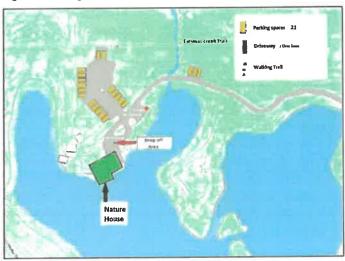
High-Level Concept of On-Site Parking Area Expansion
